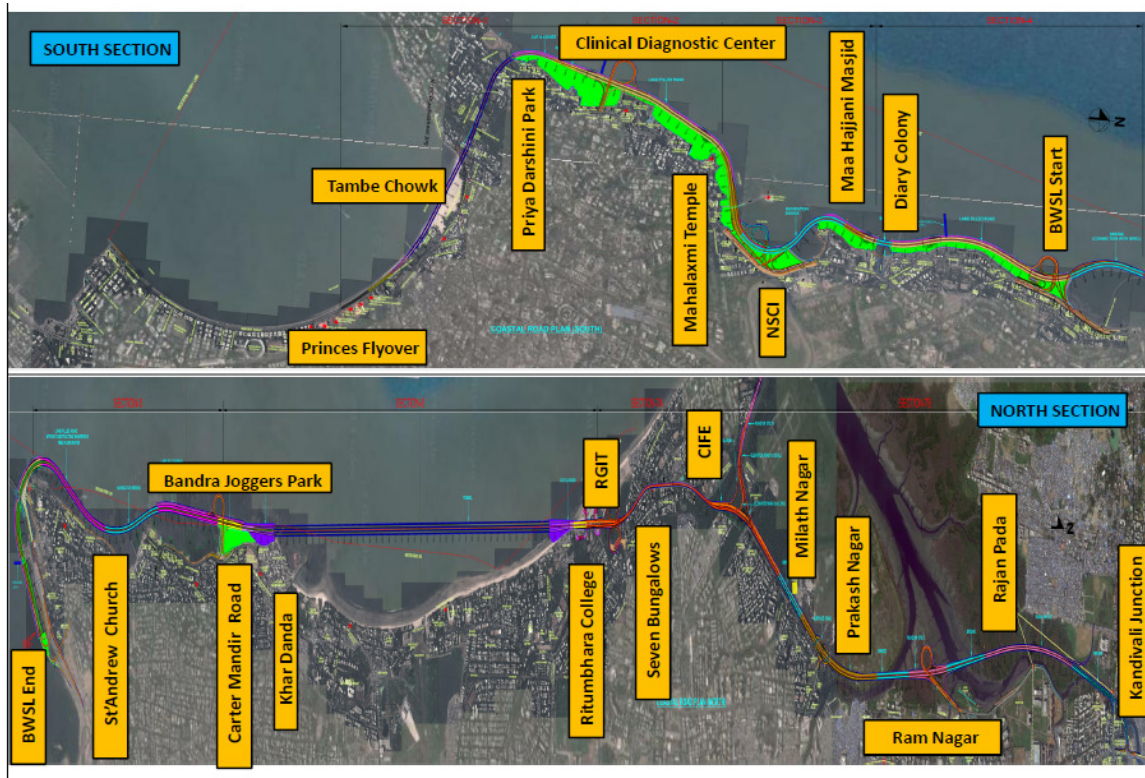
Project Alignment with Sub Divided Sections Detail
